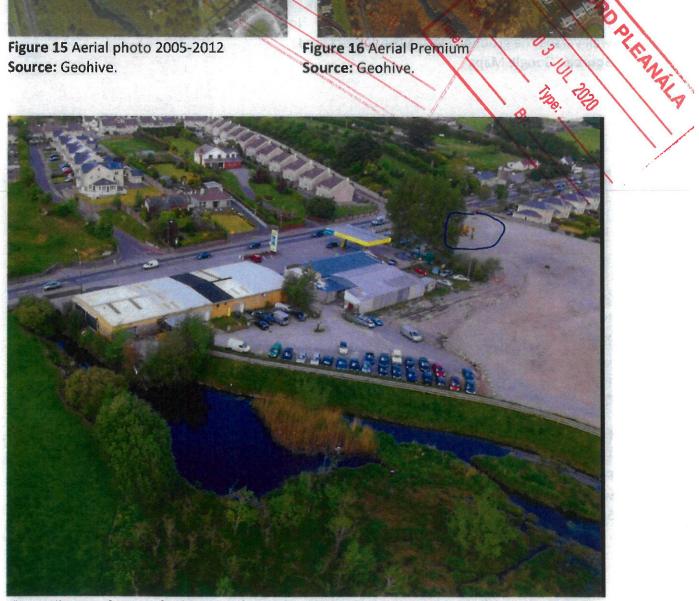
Aerial view of subject lands in July, 2016 - Note excavator on the site in Area A
